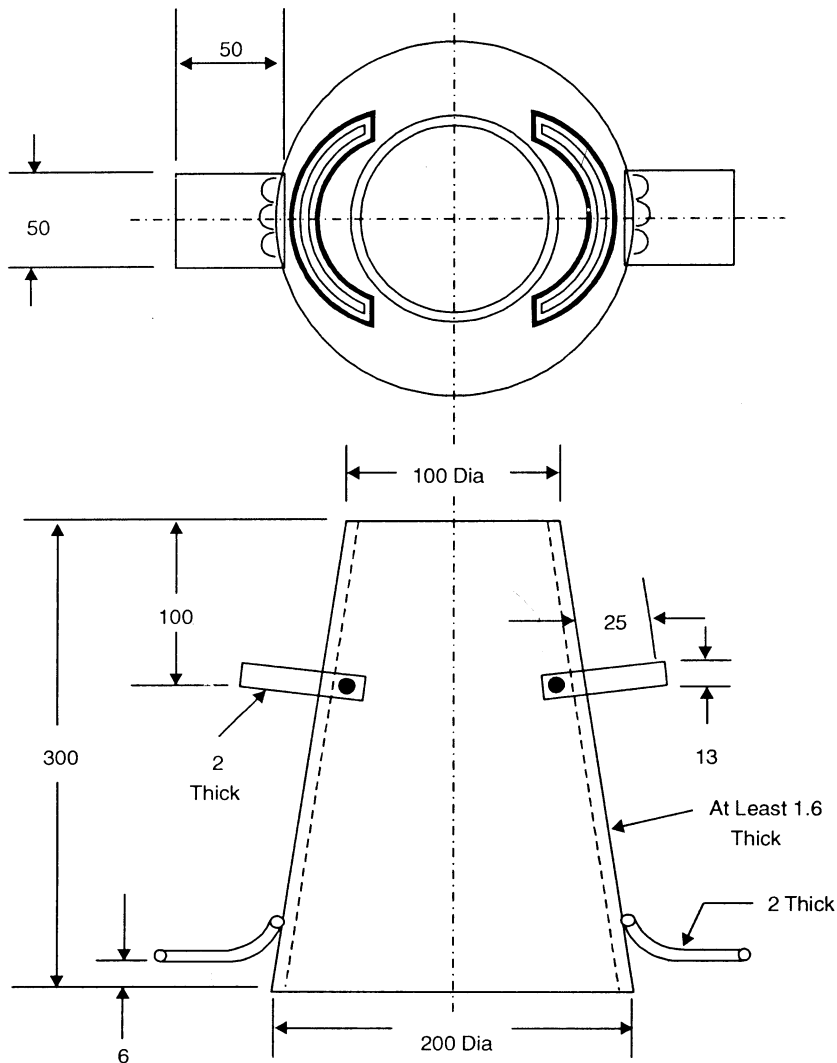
Typical Mould for Slump Test (All Dimensions are in mm)
